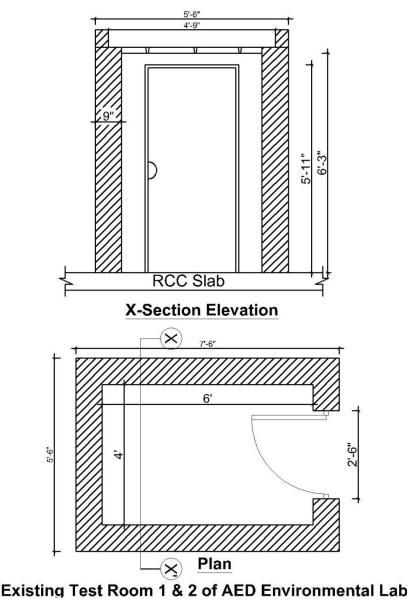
2 Plan and X-Sectional of existing Experimental Model
